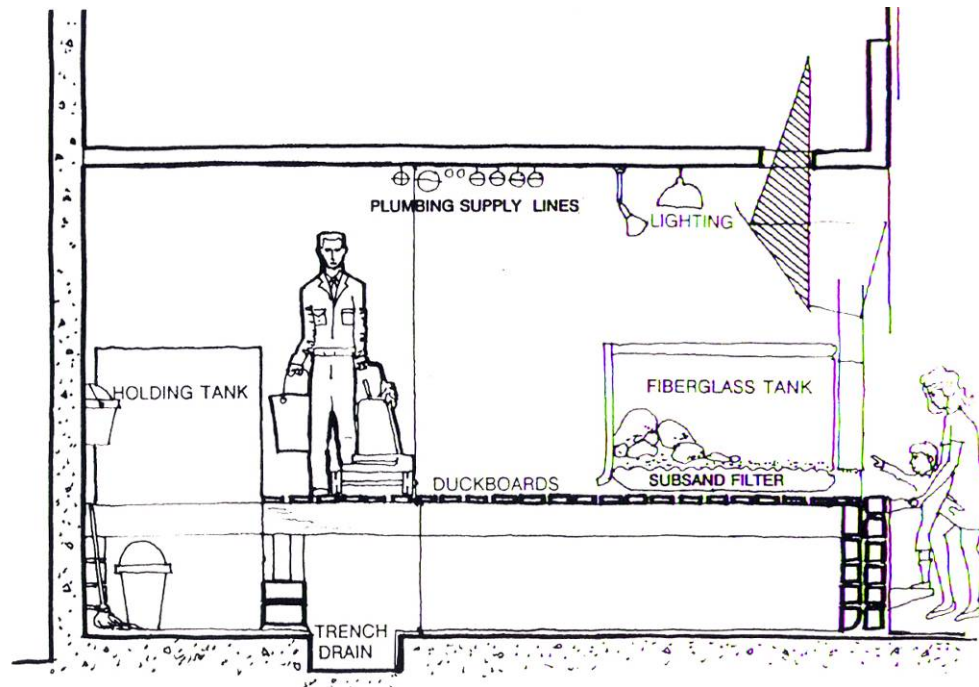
²⁶ The work area floor should be elevated approximately three feet higher than the public floor. Holding tanks should be placed along the rear wall of the back-up area and each of the holding tanks should have its own recirculation system. The holding capacity should be one-third of the display volume.
